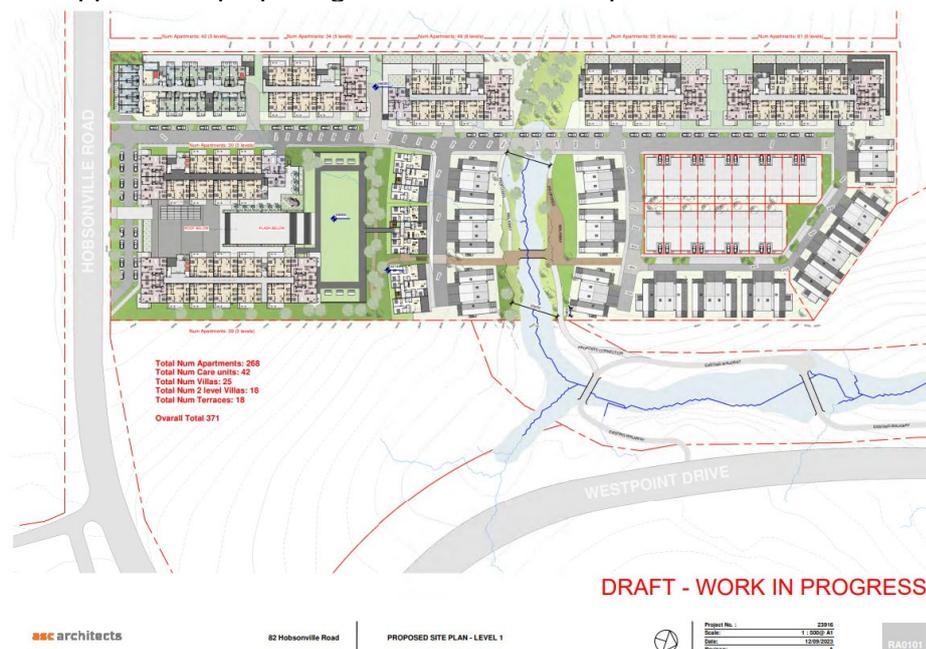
Proposed scheme from Attachment 2 – Architectural Plans
